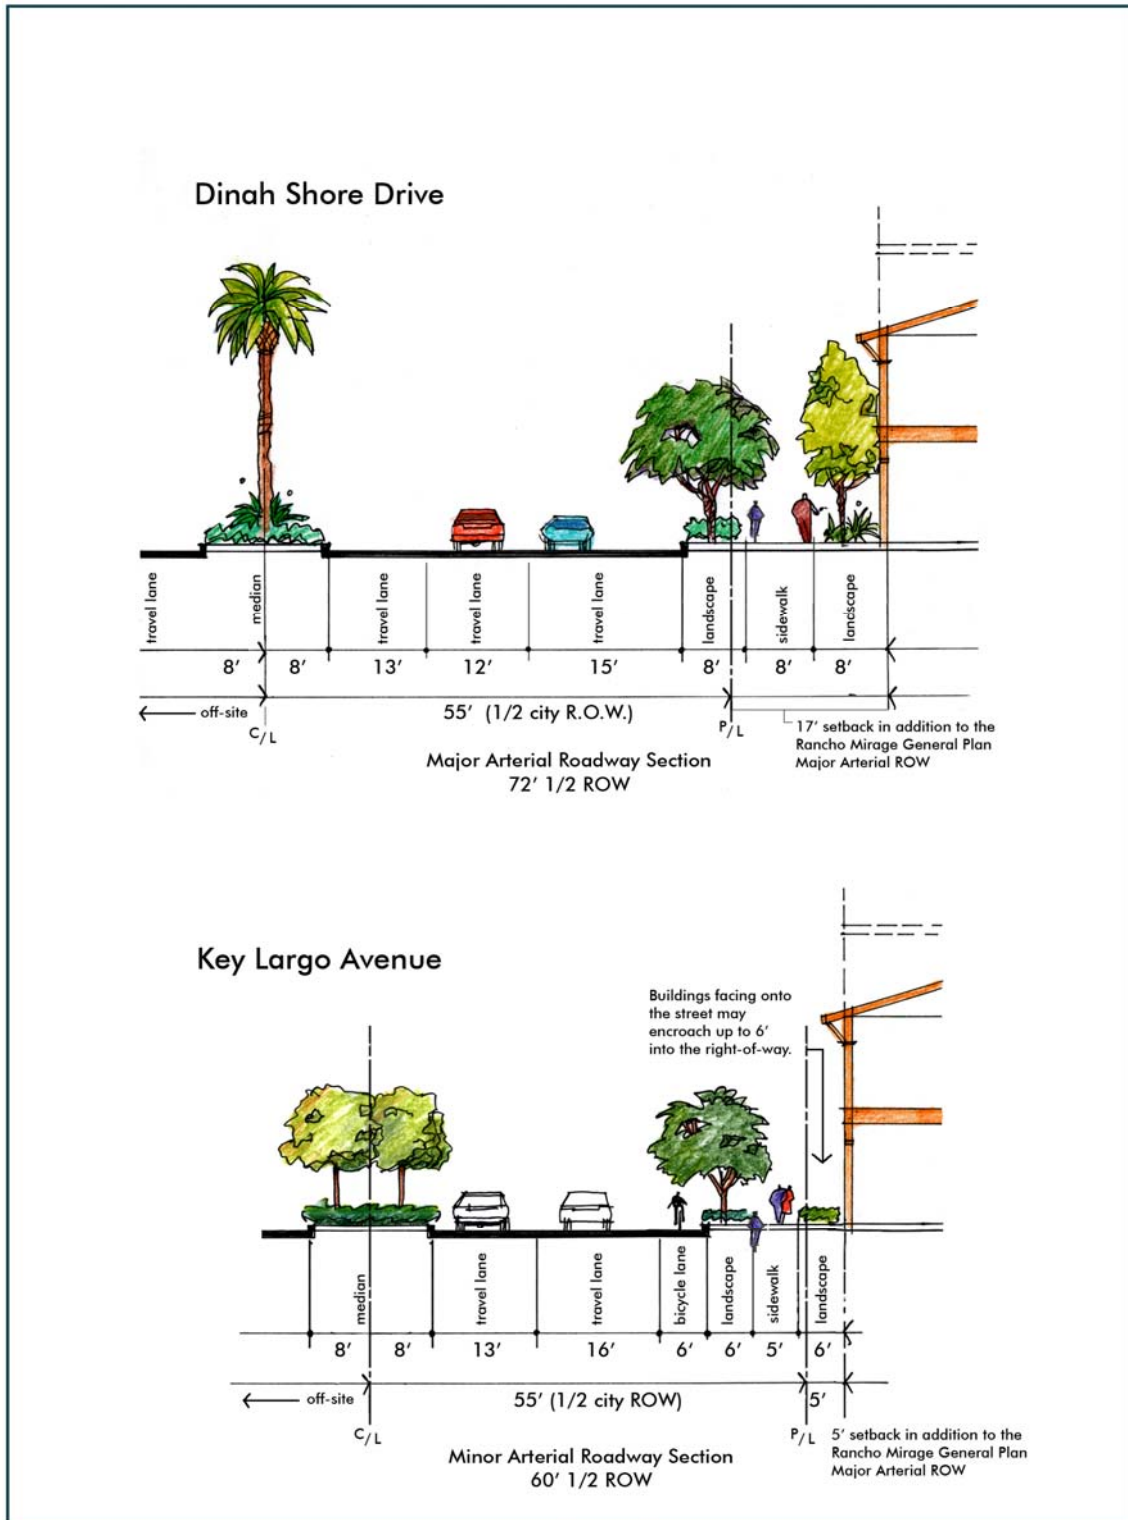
Major and Minor Arterial Roadway Sections: Dinah Shore Drive and Key Largo Avenue
